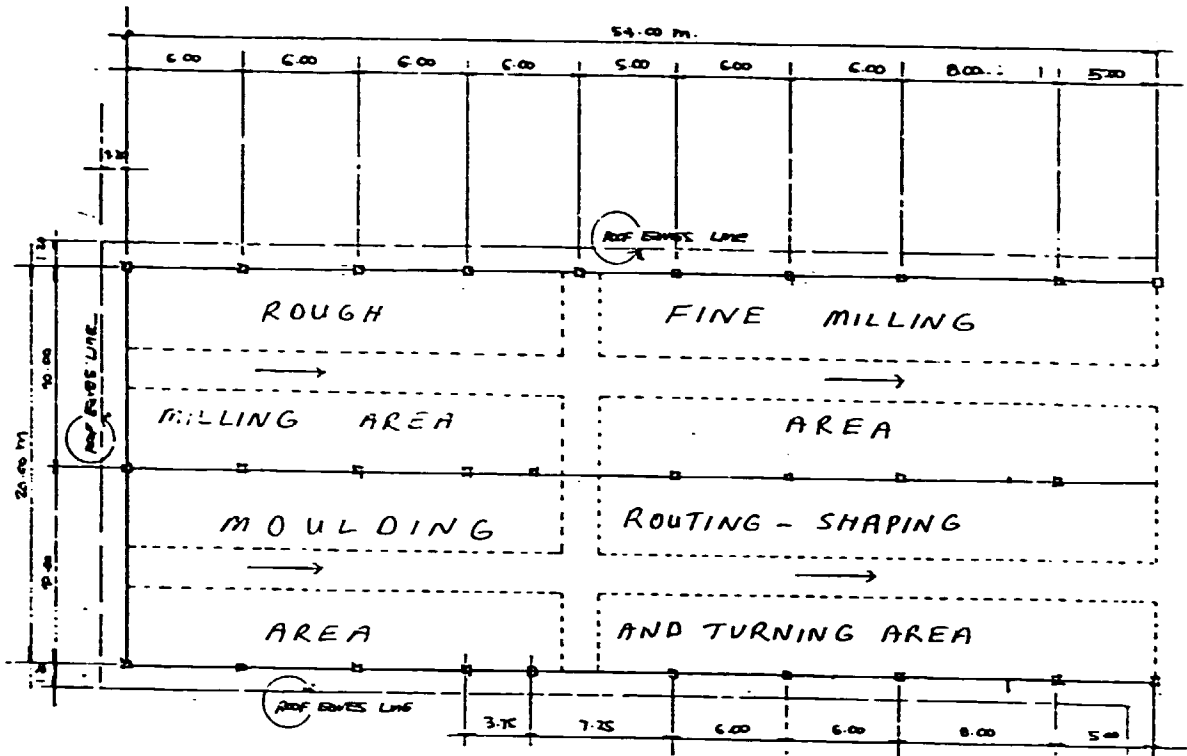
Ground Floor Plan of machining area of the Furniture Factory of Berben Wood.
